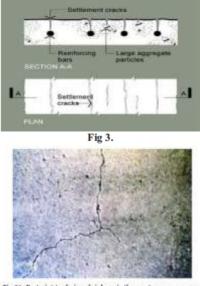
Restraint to drying shrinkage is the most common cause of concrete cracking. (A5271) Fig 4.
